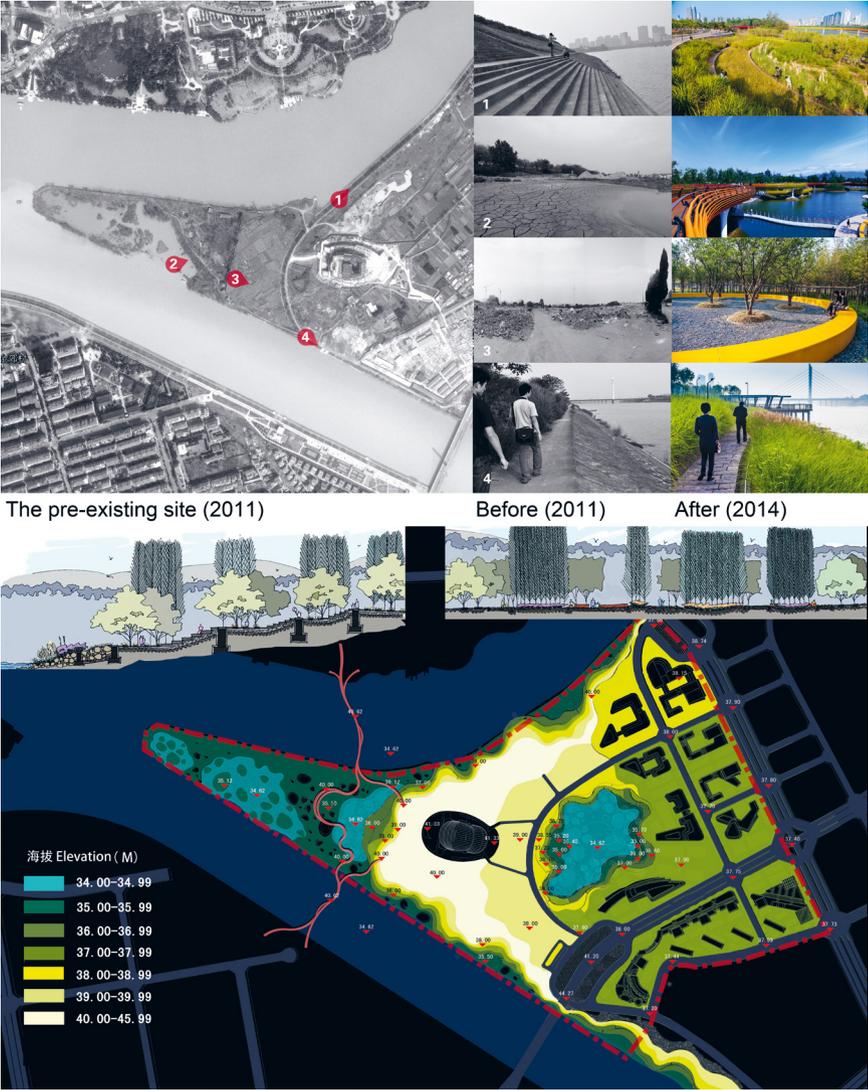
Designed elevation of Yanweizhou Park. © Turenscape Academy
